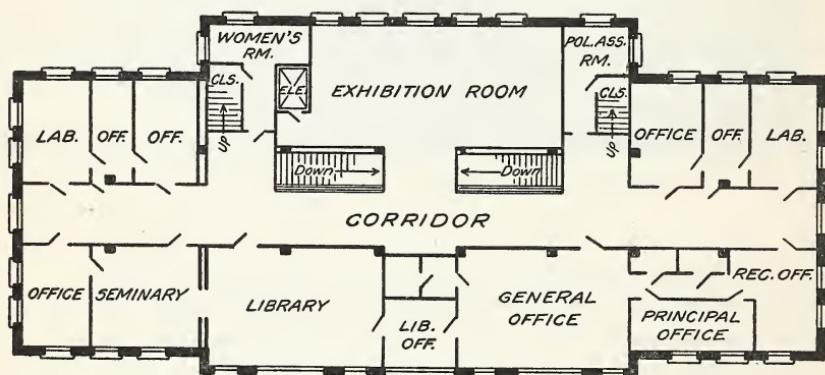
Second-floor plan, poultry husbandry building, Cornell University.
